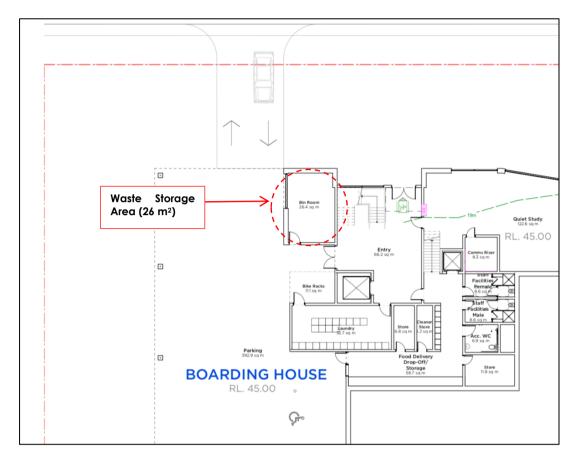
Location of waste storage area for Boarding House: western corner of site (Source, PMDL, 2019).
